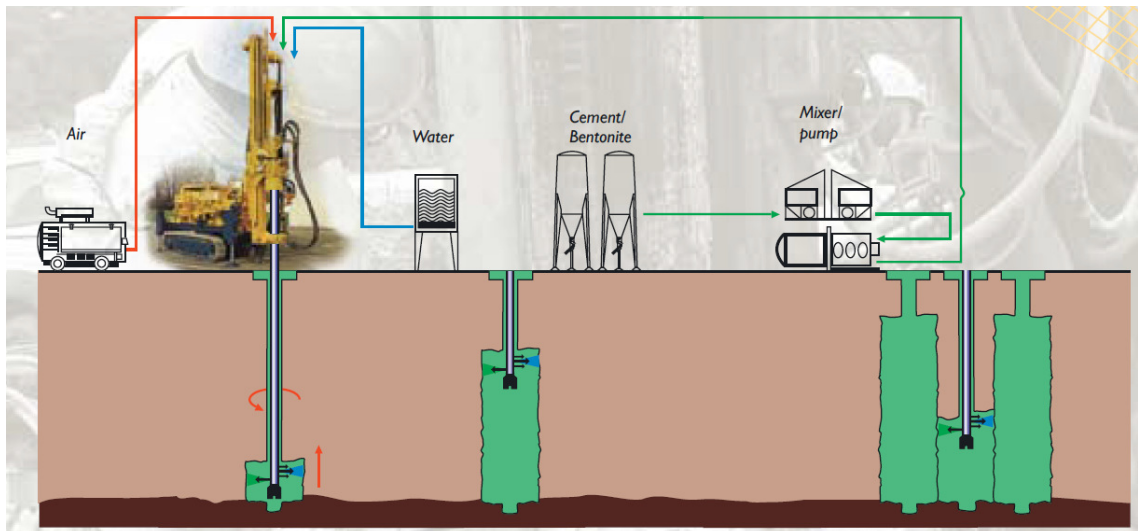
Jet grouting: triple system (Keller. Accessed 19.11.2011
